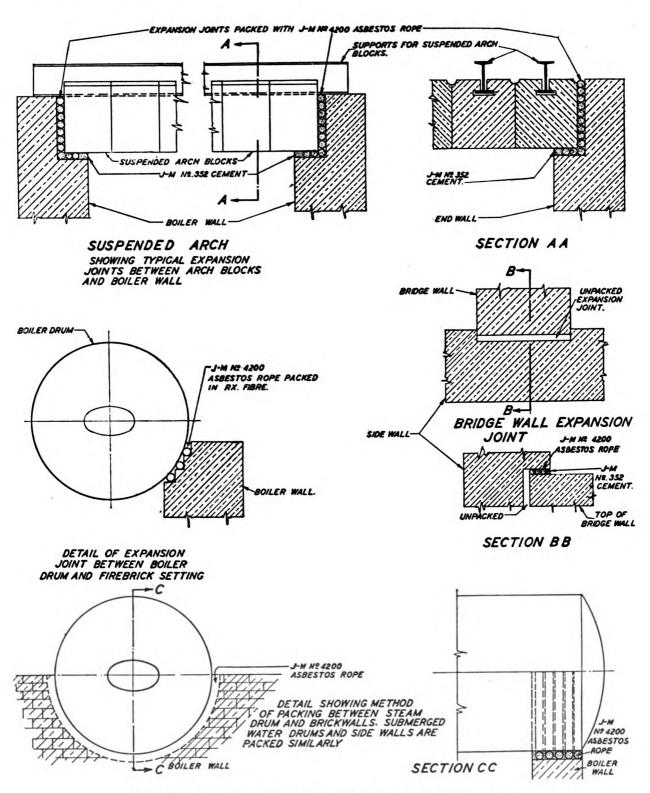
Expansion Joints at Suspended Arch, Bridge Wall and Steam Drum
